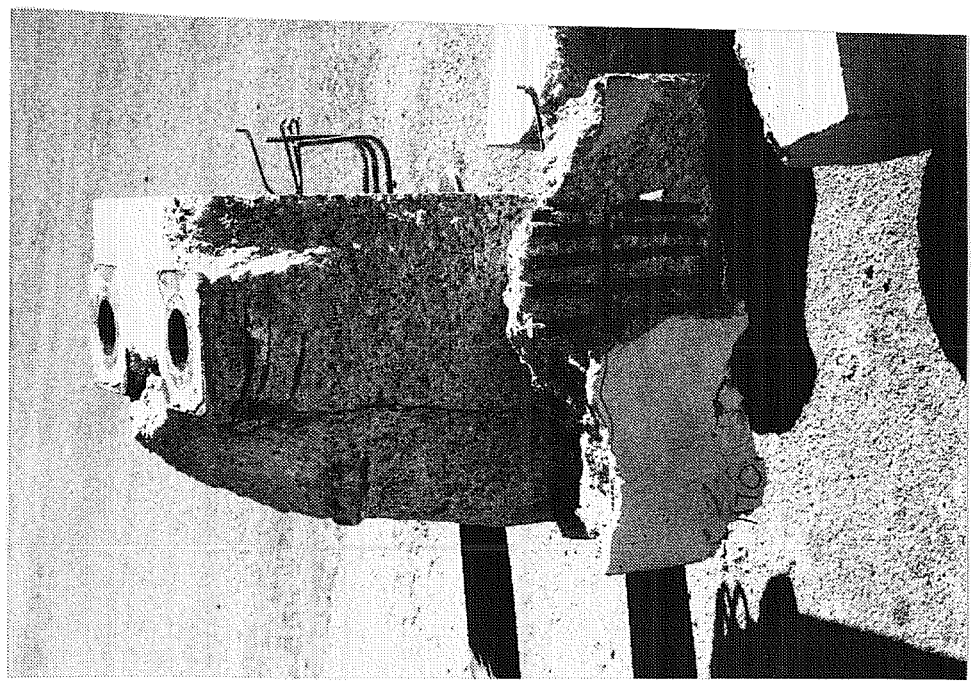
Cracking at Diaphragm-Web Interface (Specimen Dia1)
